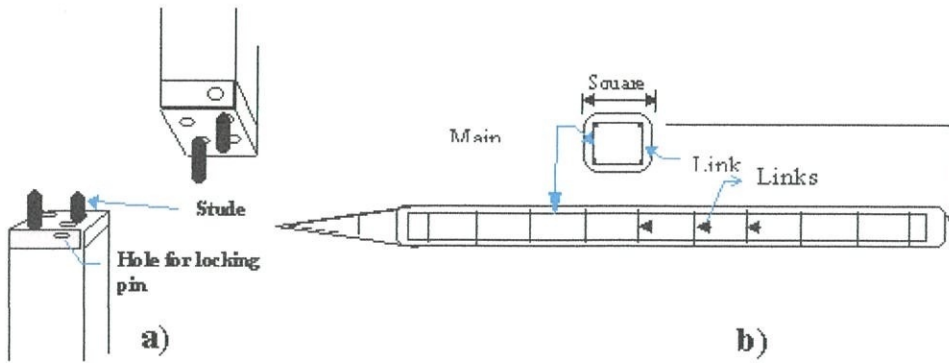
a) concrete pile connecting detail. b) squared pre-cast concert pile
